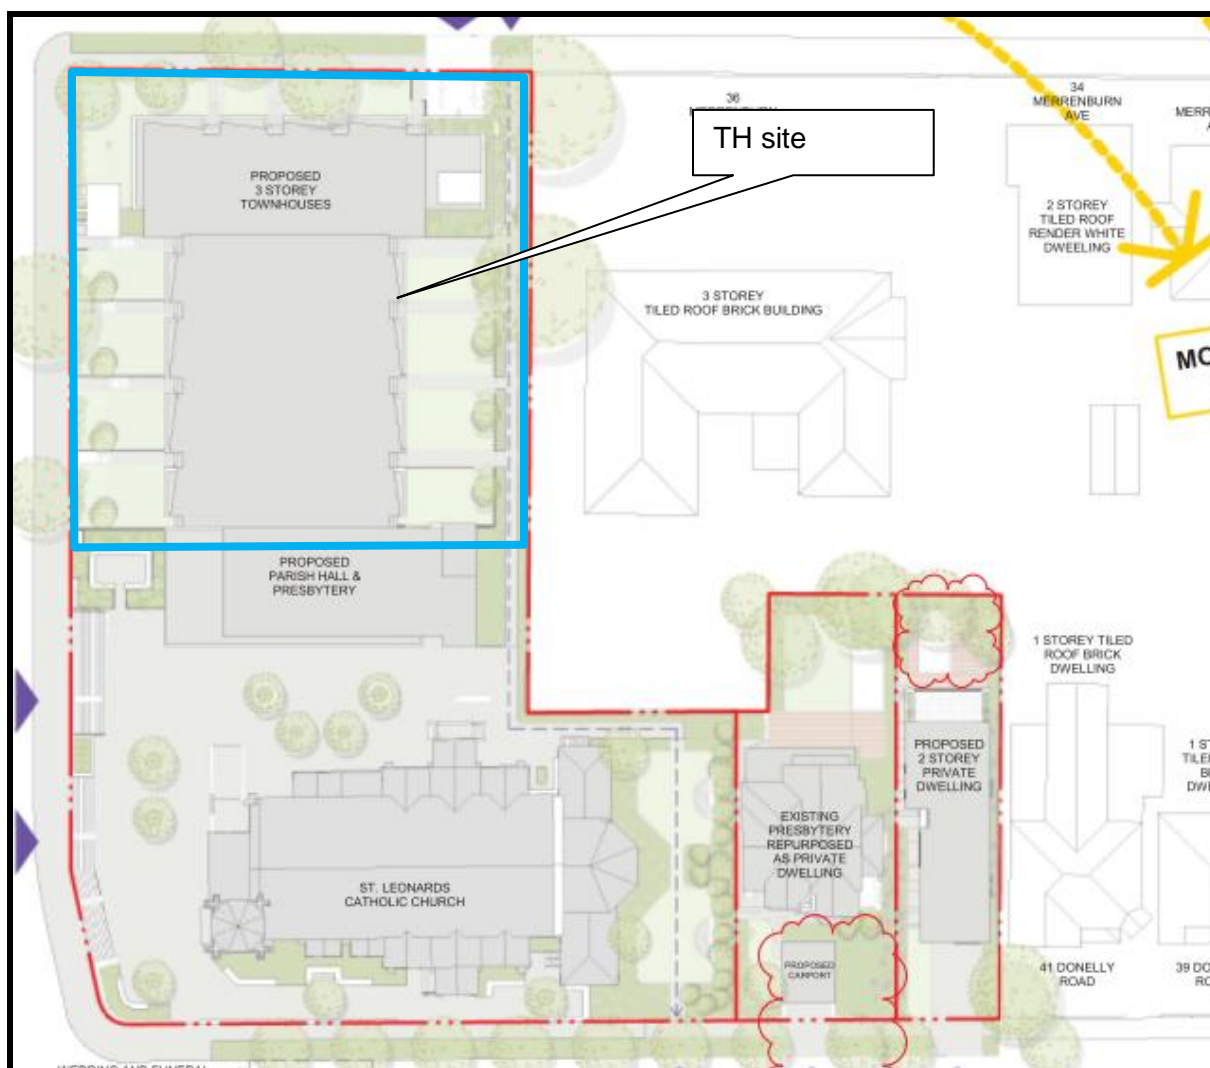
TH site (Extract from Architectural plans lodged by applicant)
